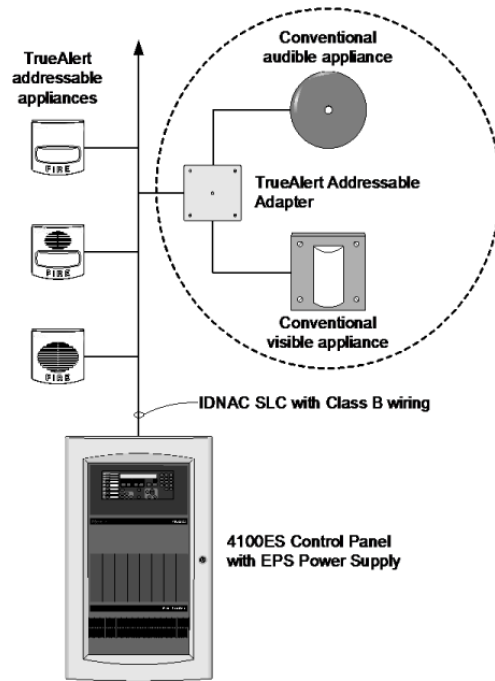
TrueAlert Addressable Adapter Module, Typical One-Line Wiring Reference
